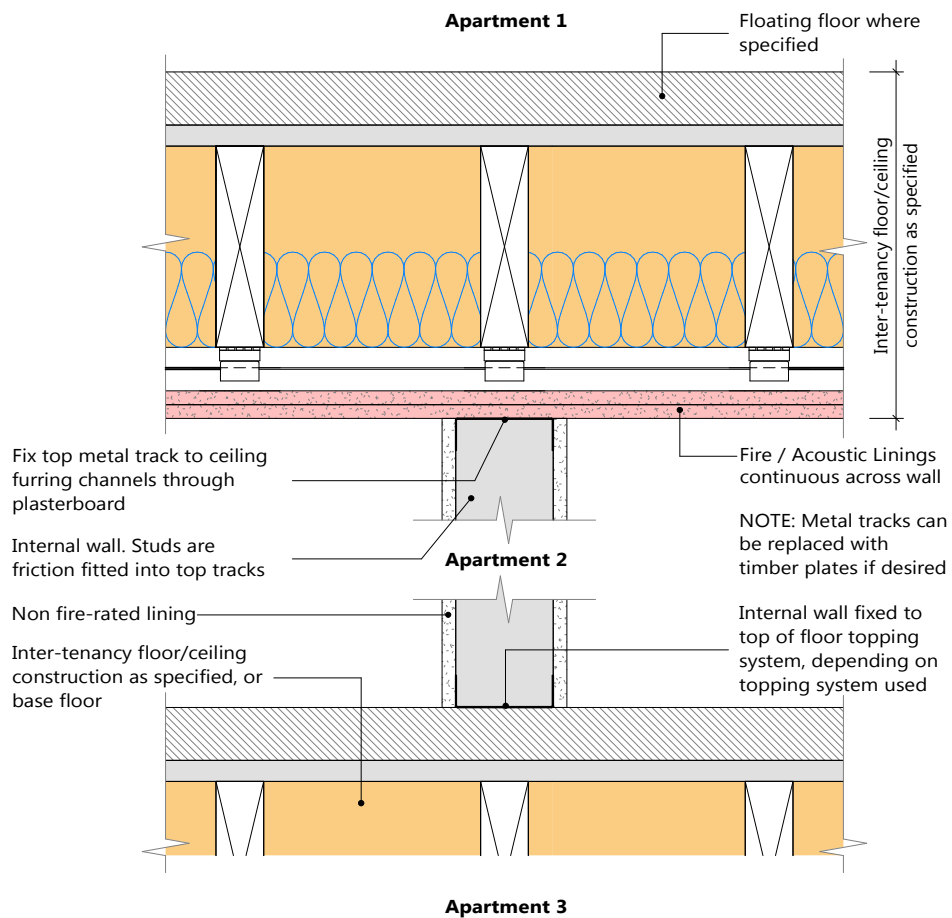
Non-structural internal wall using metal tracks or timber plates attached to ceiling furring channels and sitting on floating floor
